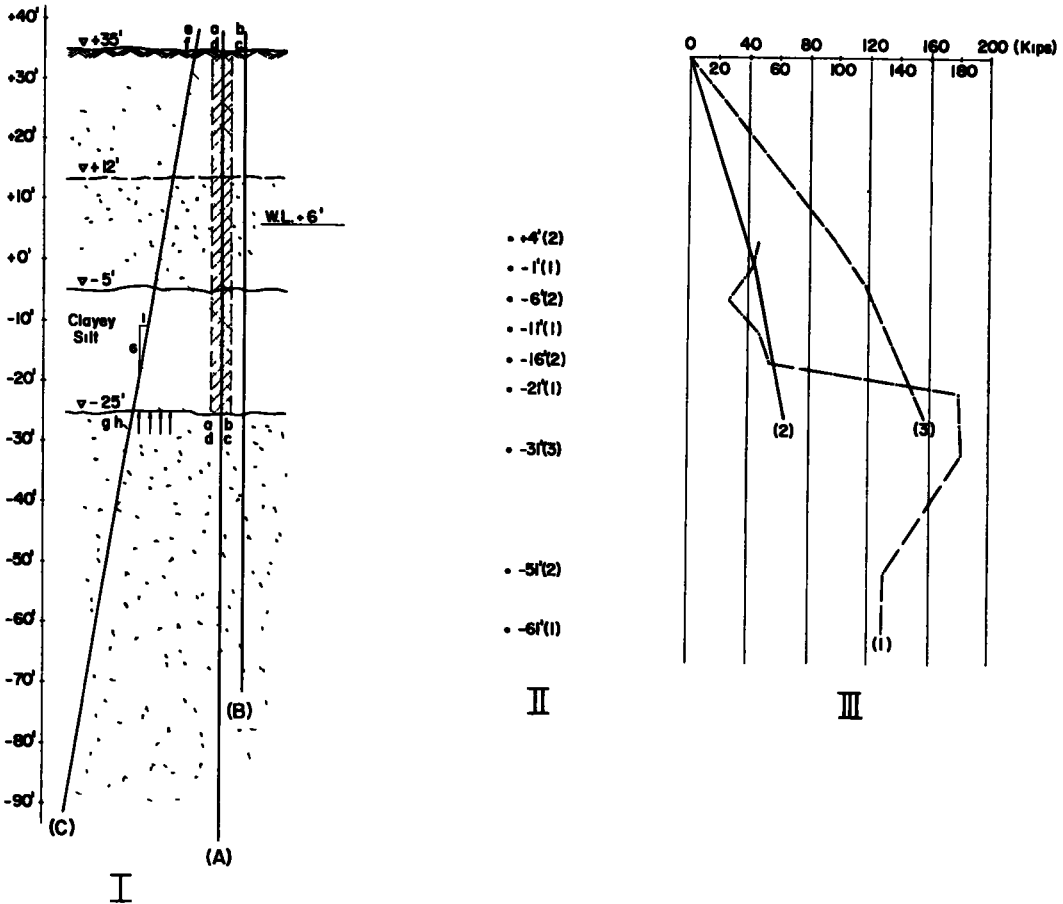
(I) Section I-I on Figure 18; (II) Elevations of SR4 strain gages (number of gages shown in brackets); (III) Computed pile loads: (1) from SR4 readings (by the authors); (2) weight of soil column abcd; (3) weight of soil prism bcehgh.
